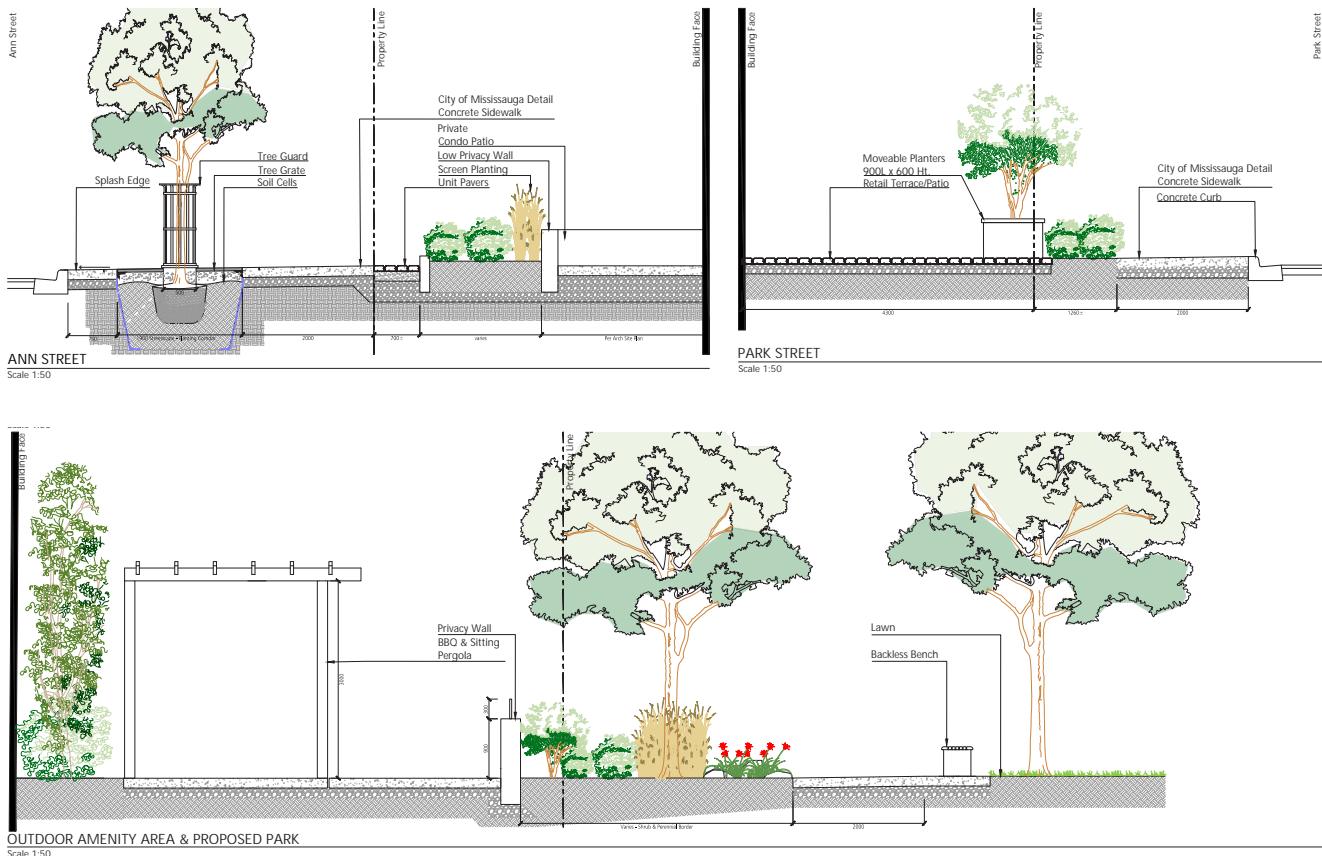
Landscape section drawings showing the generous public realm and sidewalk area that is proposed
